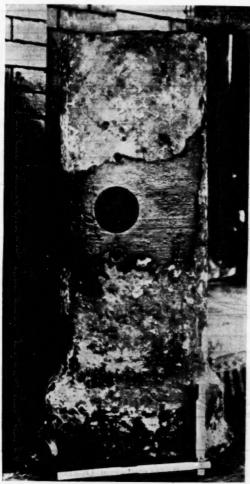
Section of 12-inch Pipe Taken out at Adams and Clark Street (First 12-inch cast iron pipe laid)
